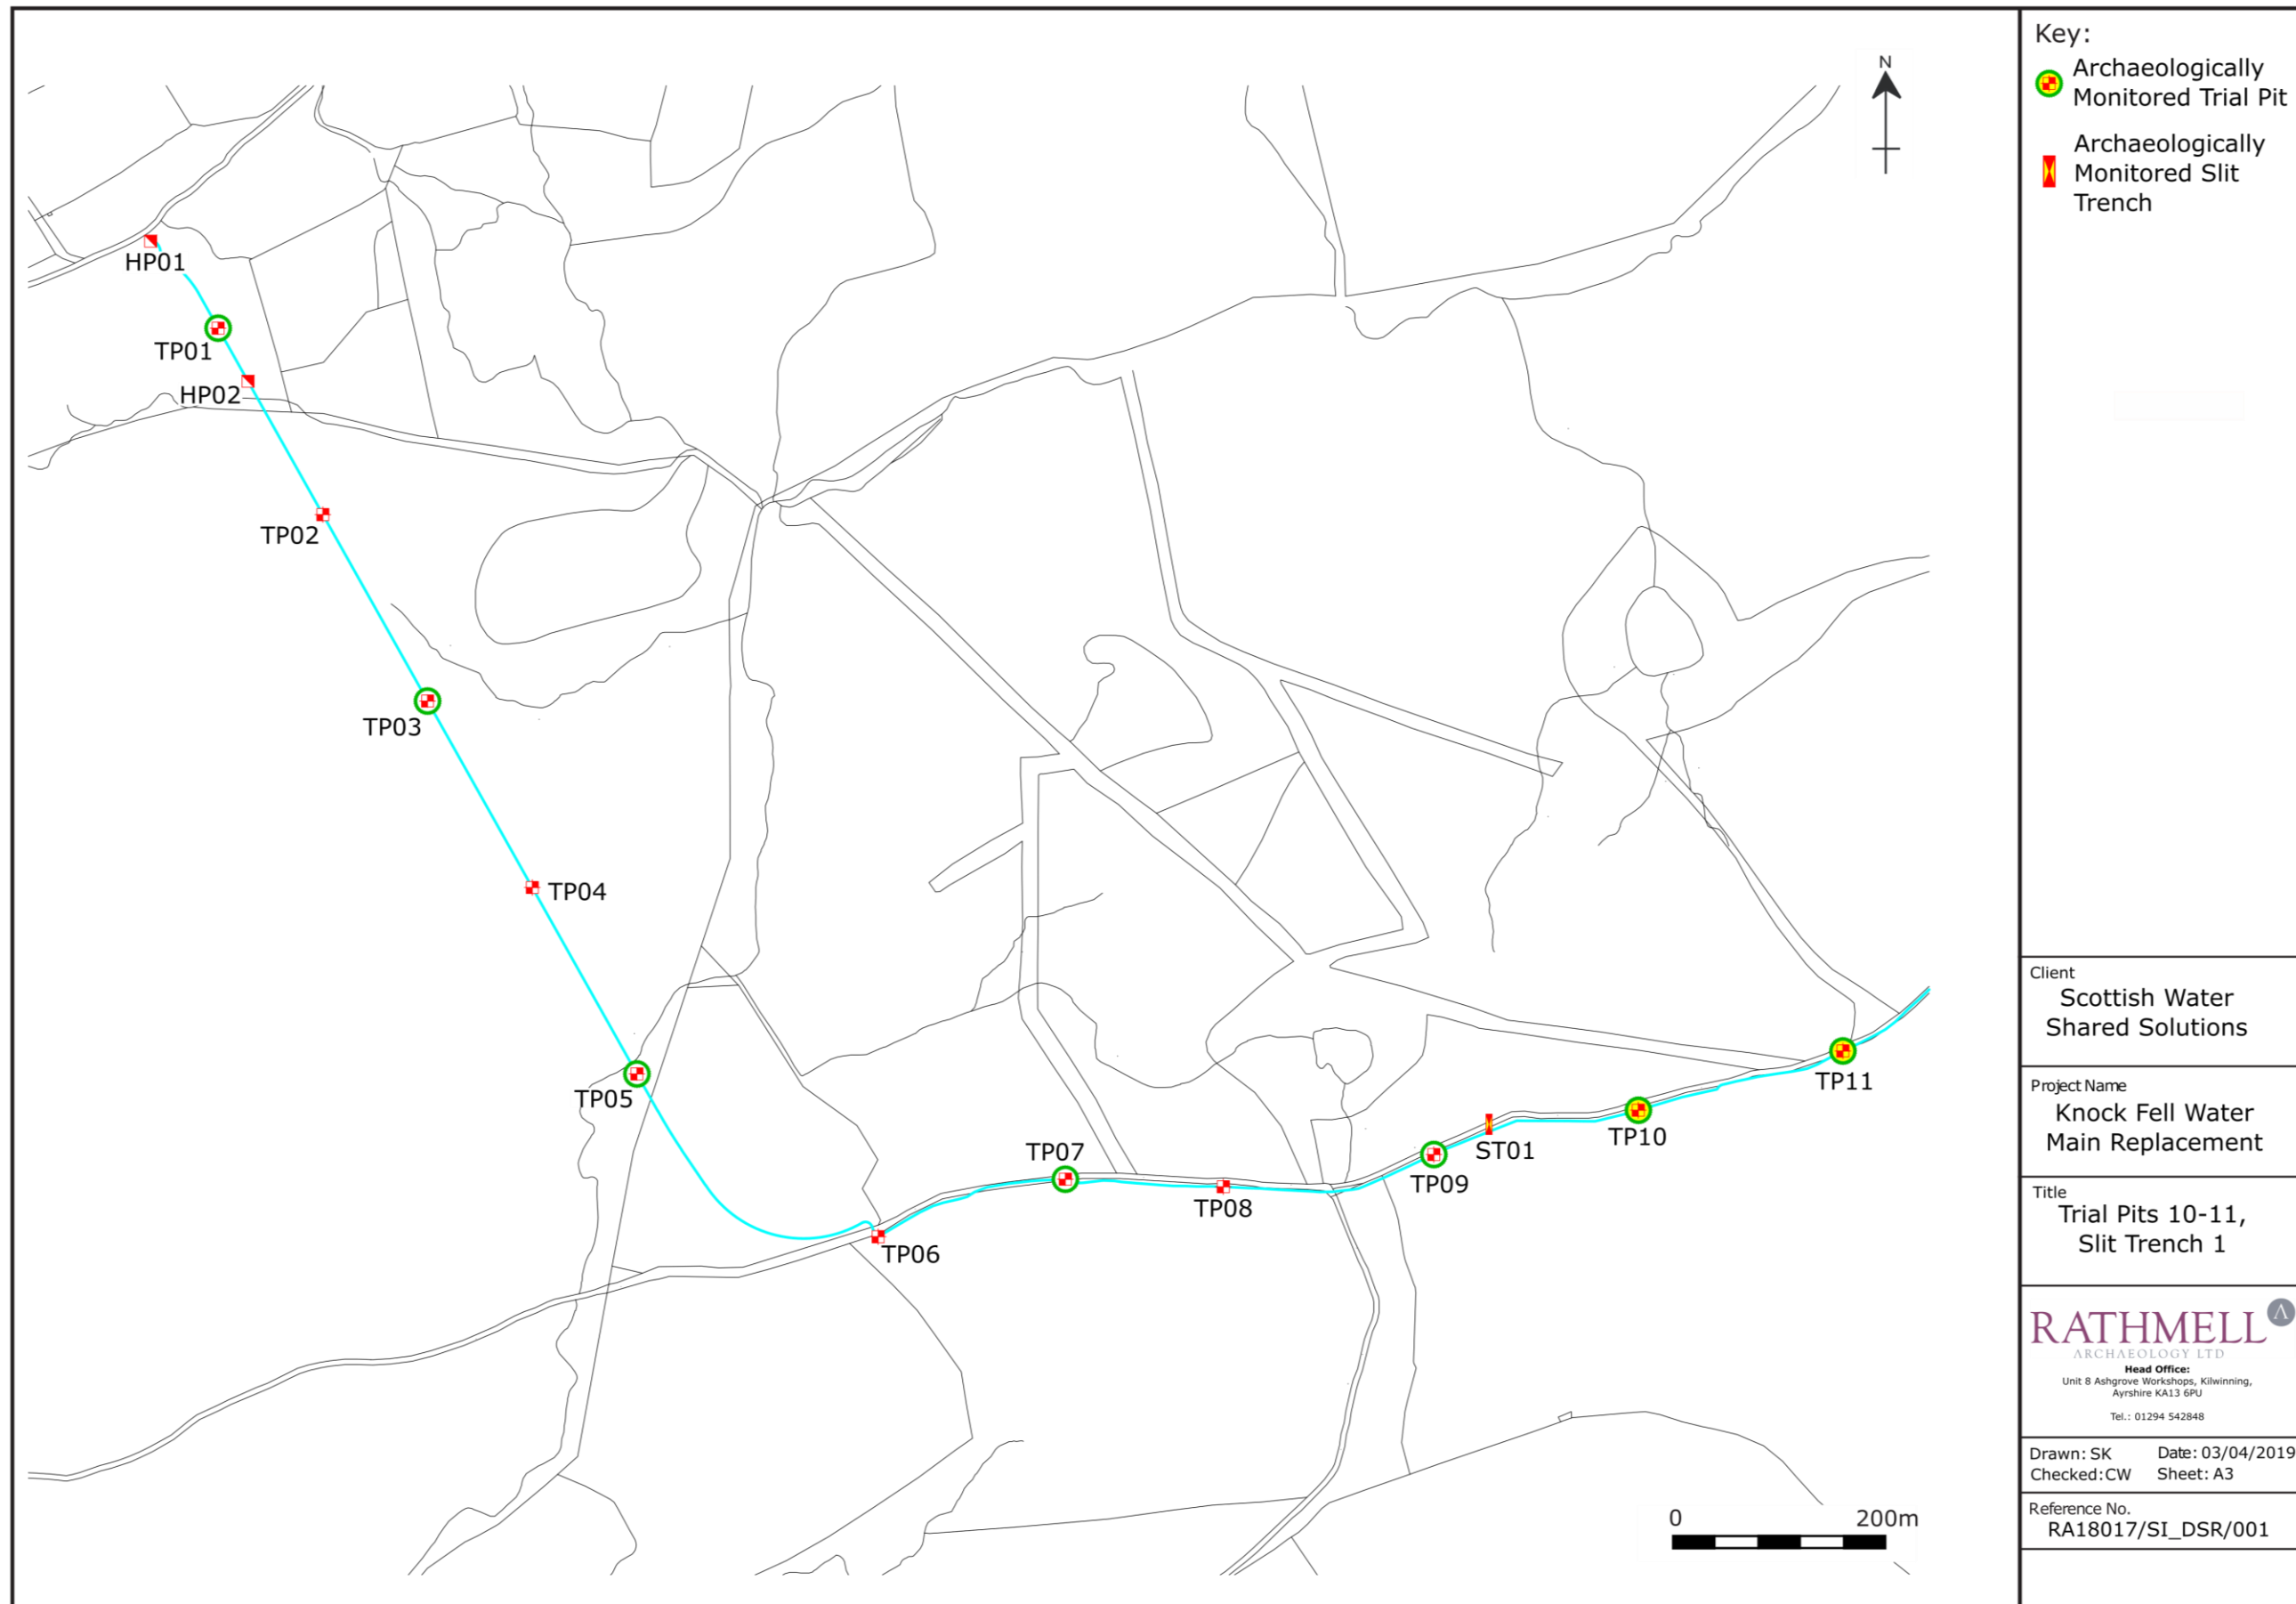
Plan showing locations of Trial Pits 10- 11 and Slit Trench 1.
